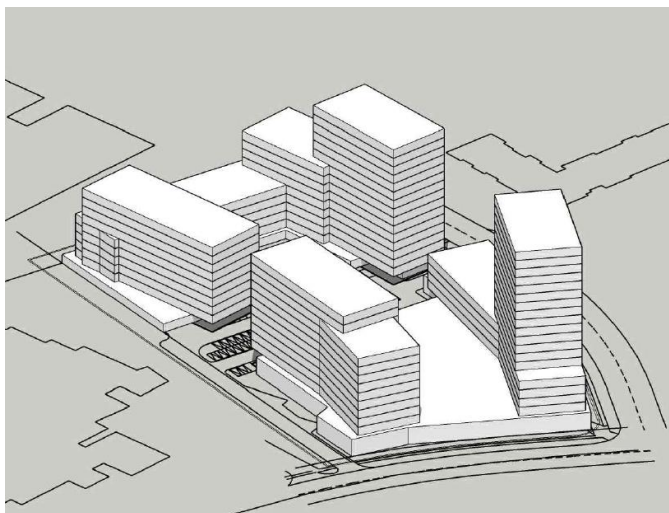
Building 3D rendering - internal courtyard view from the main east-west internal road
